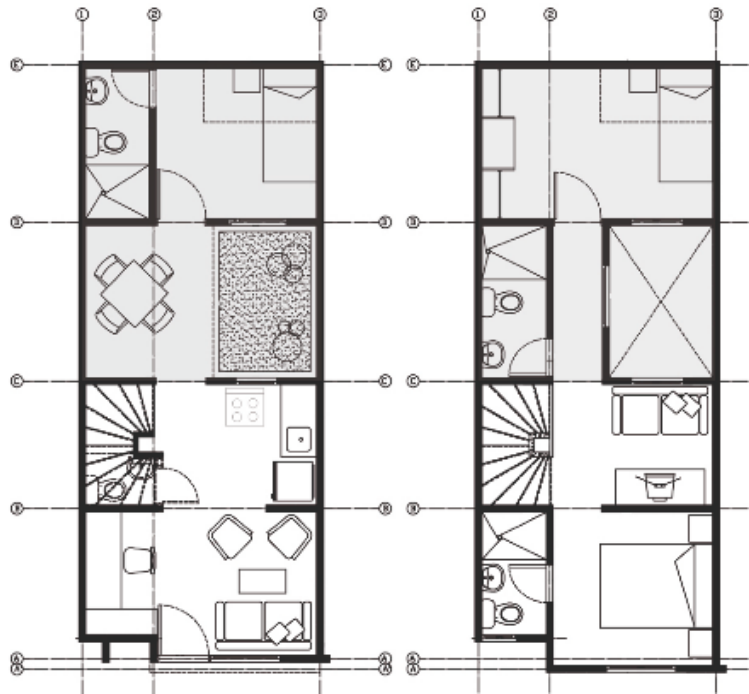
Plans of first level (left) and second level (right) of the extended unit as proposed by the developers.
